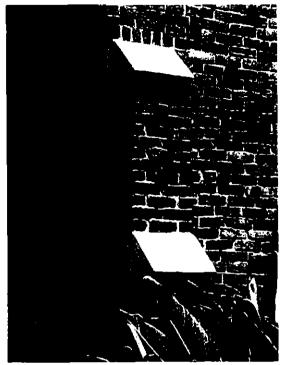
Close up of buttress detail found on all buildings throughout the property.
